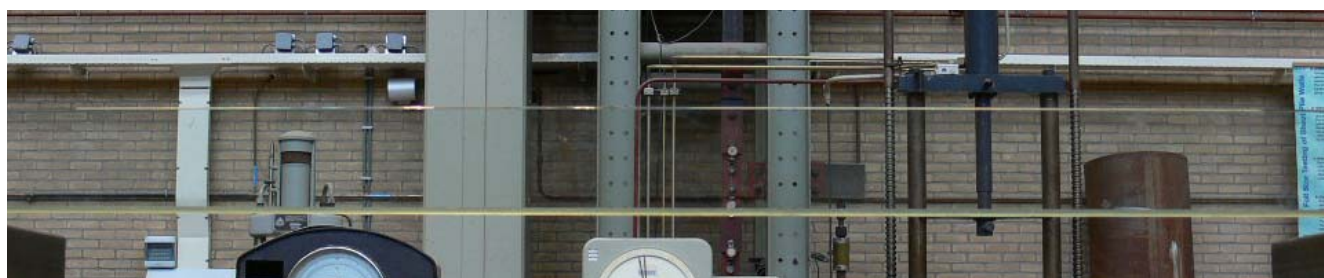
, 90mm high glass girder mounted with glass fiber reinforcement in SGG Plug-in groove in bottom of girder.
